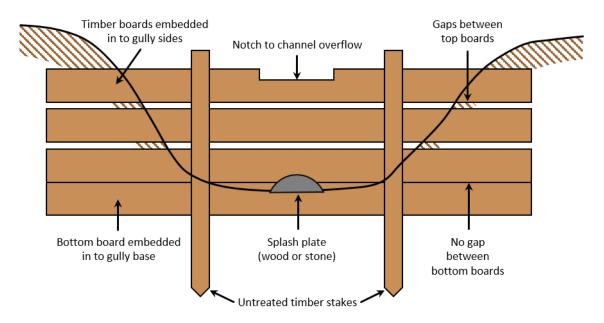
| A timber dam. Showing the front view a timber dam. Pictures adapted from Moors for the Future Partnership fact sheets.
